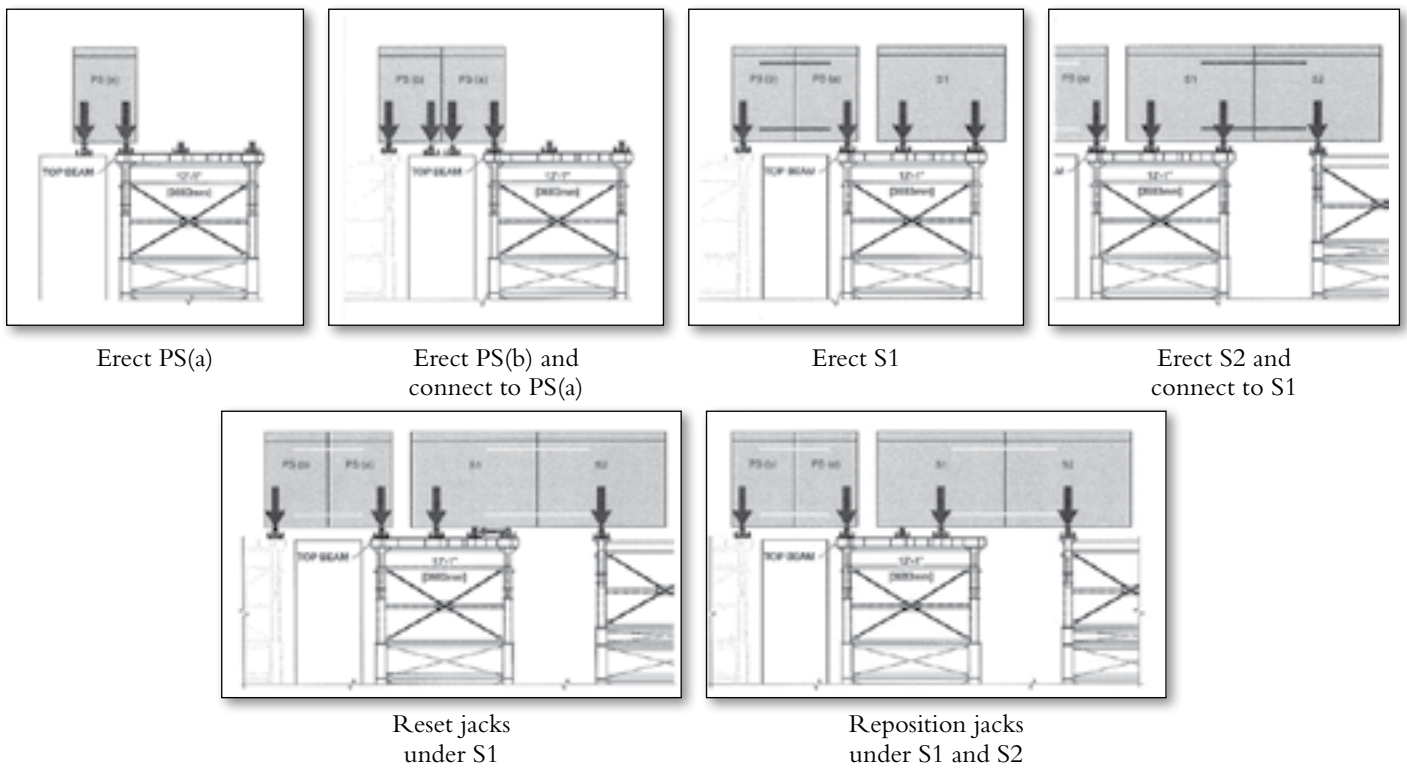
Typical segment erection sequence of a span. Note: PS indicates pier segment and S indicates span segment. Figure: Structural Technologies.
